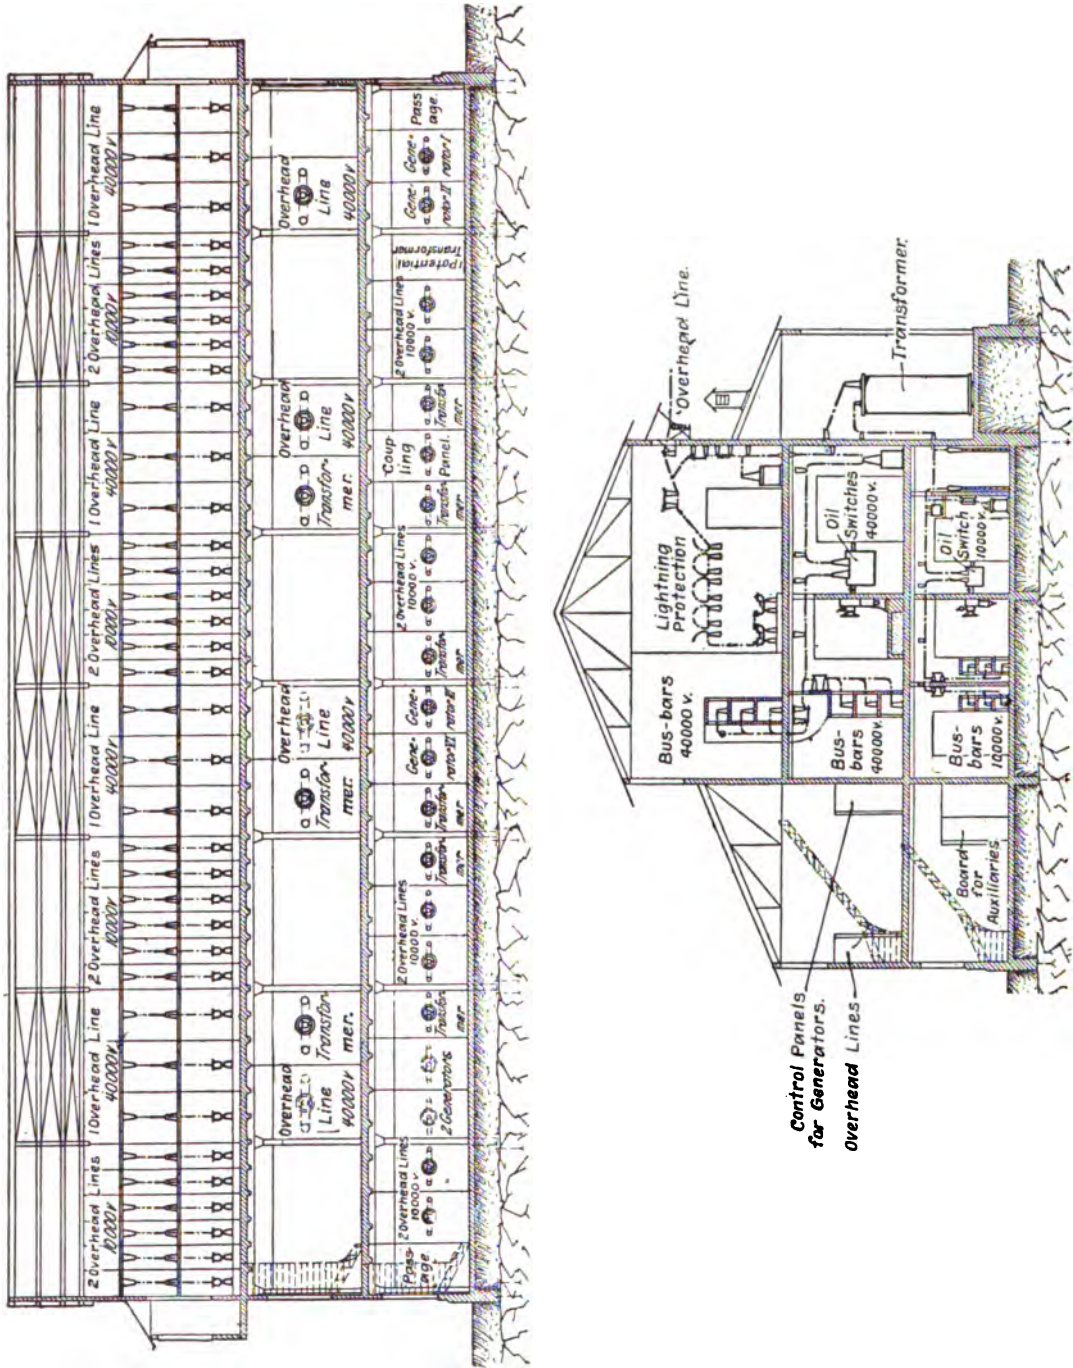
Simmerpan Power Station. Longitudinal and Cross Sections through the Switch House.
